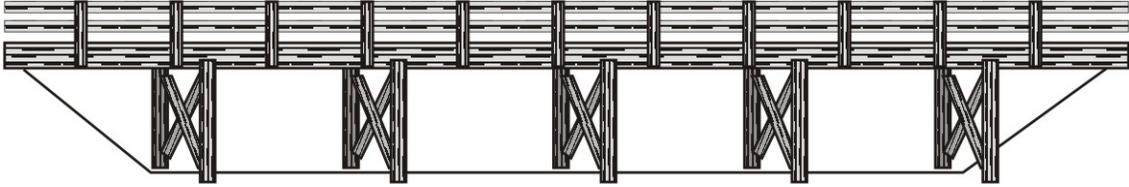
Fishing Bridge (1937), spanning Yellowstone River at East Entrance Road, Yellowstone National Park, Park County, Wyoming. This NPS-built rustic timber bridge was erected on pile bents.
